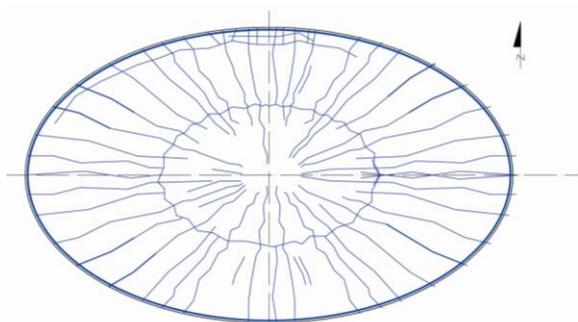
Bottom view of dome roof with a schematic depiction of the cracking pattern.
